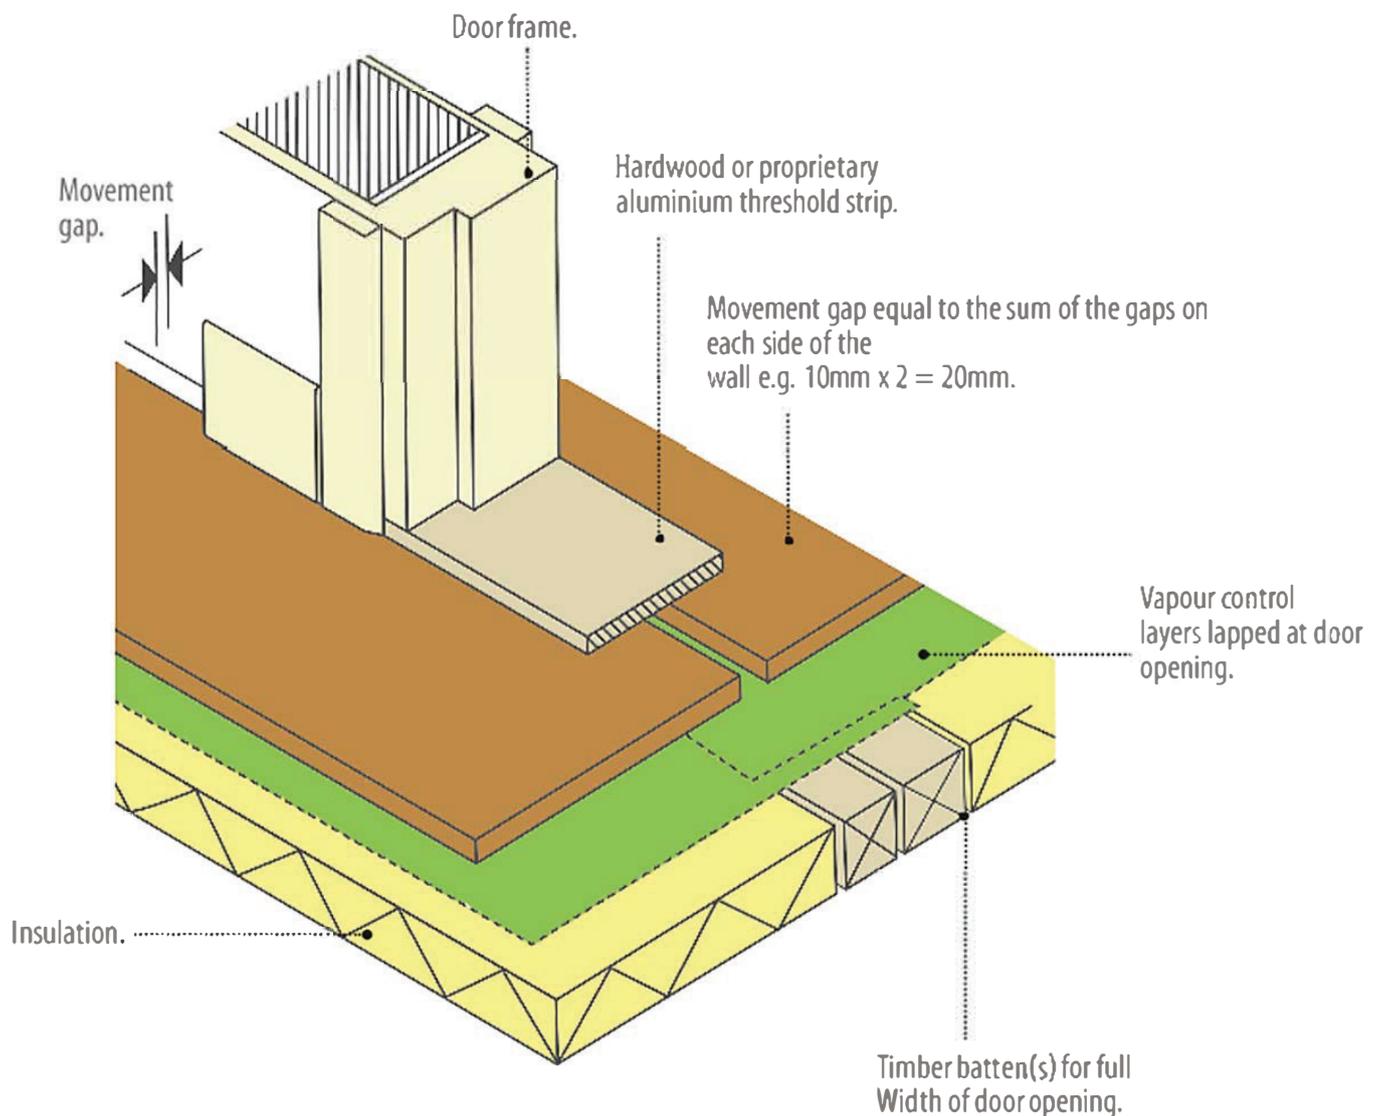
Details at the threshold of a doorway in a wall which is built off the supporting concrete structure when a continuously supported floor is used.
